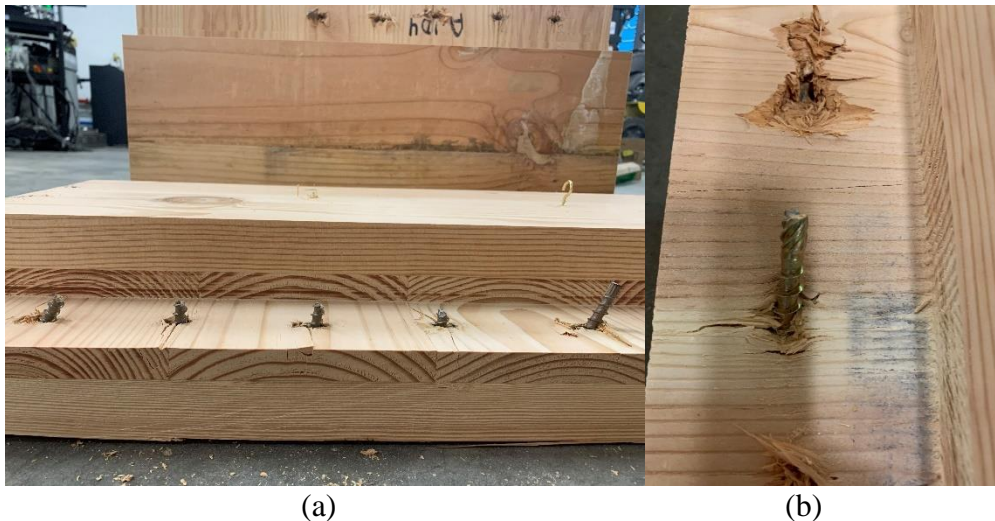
Half-Lapped, Specimen 1 (a) and 2 (b), Cyclic Test Failure
